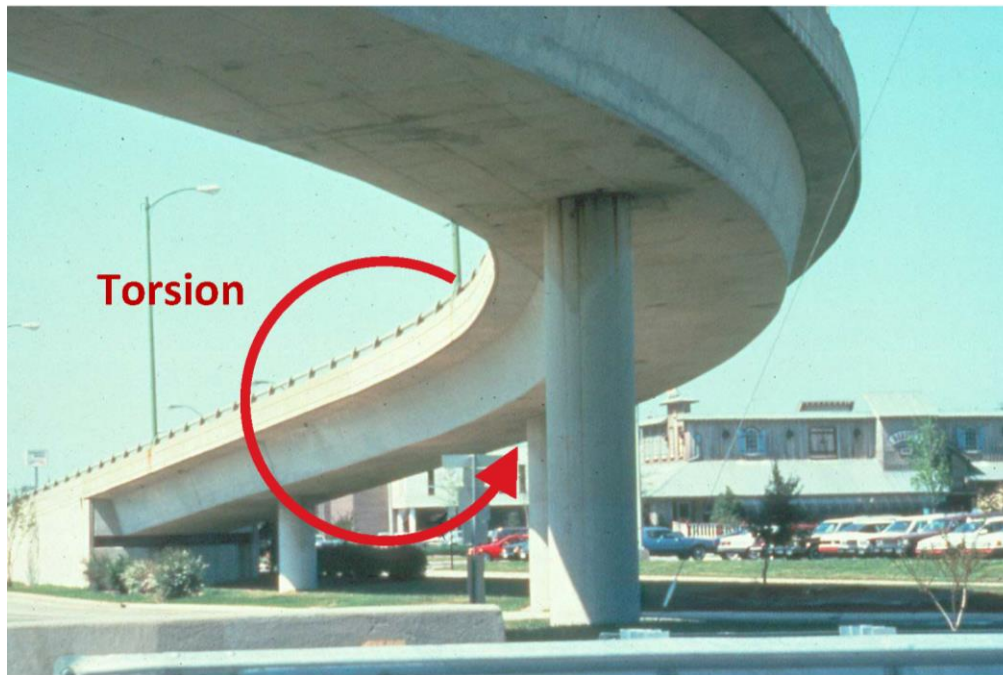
Curved Girder Bridge Showing Torsion Forces
